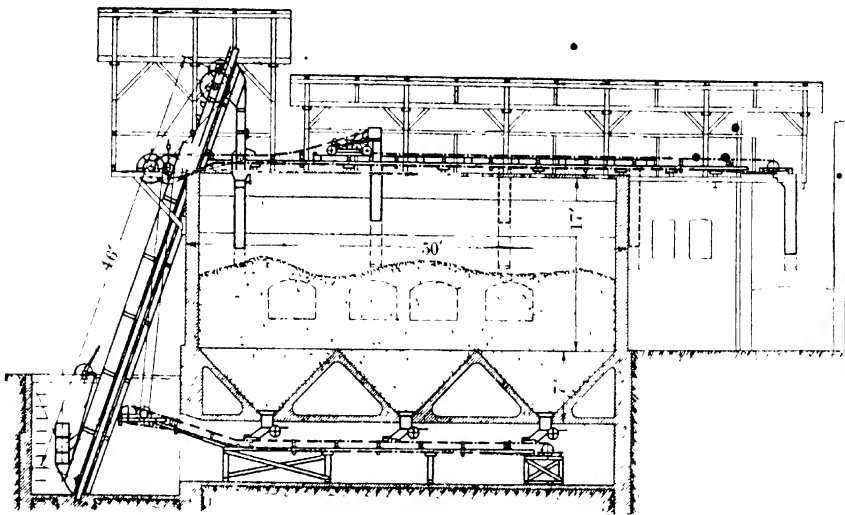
COAL STORE EQUIPPED WITH BUCKET ELEVATOR AND TWO BAND CONVEYERS
